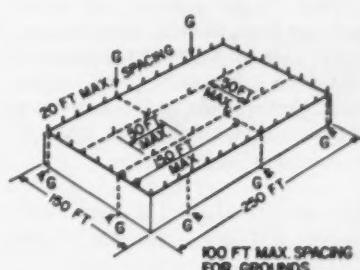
One-story building; arrange terminals at 20-foot intervals around perimeter. Other roof terminals on this building should not be over 50 feet apart.
